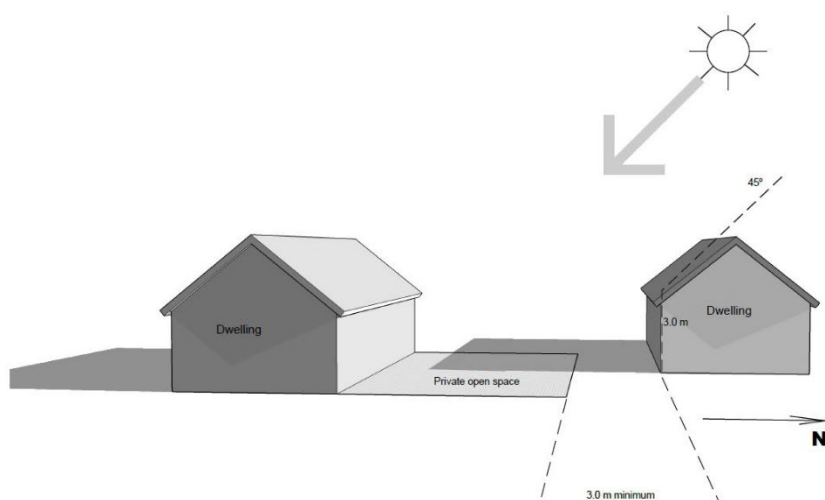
Separation from the private open space of another dwelling on the same site as required by clause 10.4.4 A1(a)
